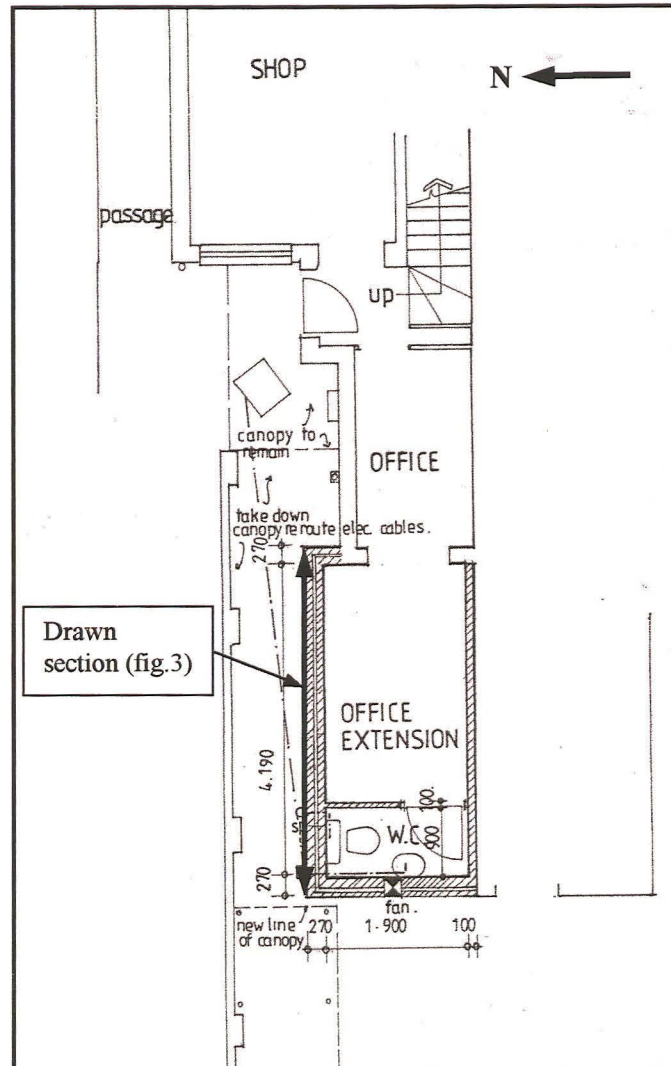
Architect's plan of proposed extension (Scale 1:100)
